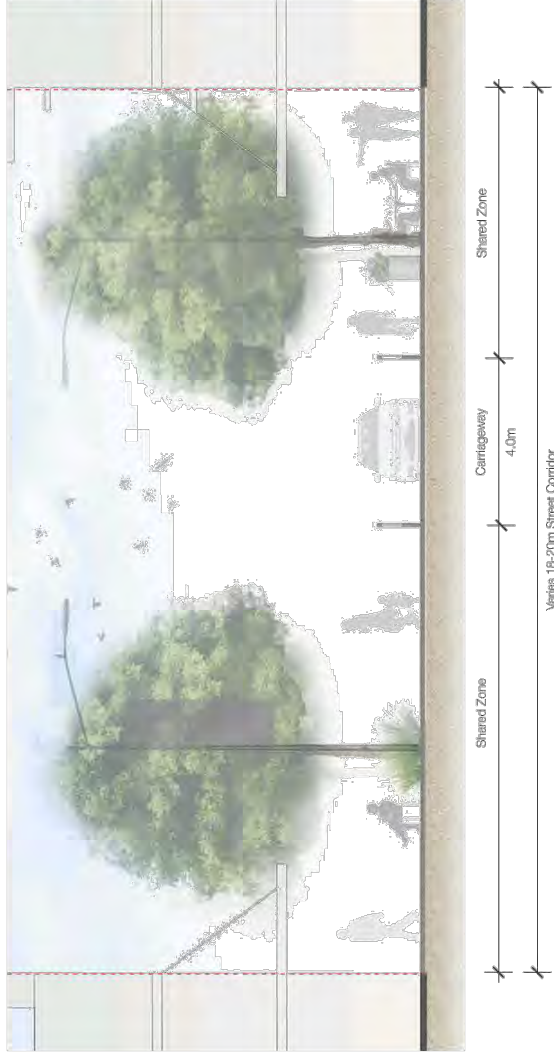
Typical Cross-Street Connection Section and Character Imagery
